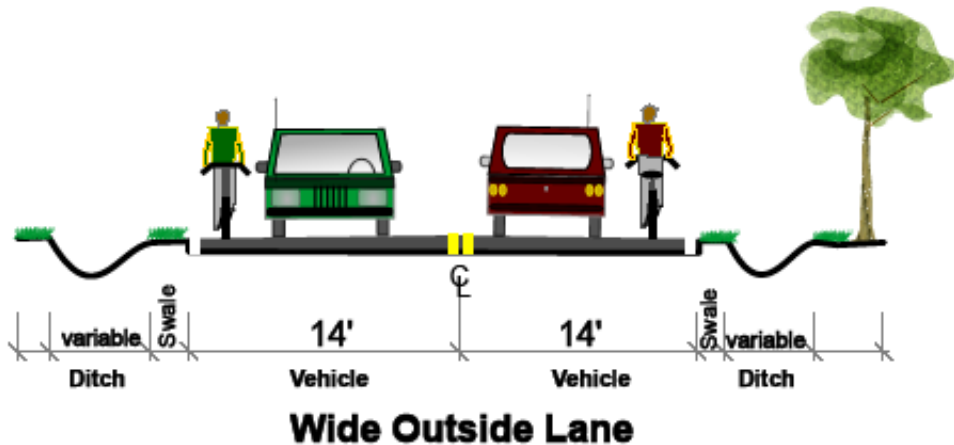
Shared Roadway Cross-section with Wide Outside Lane
